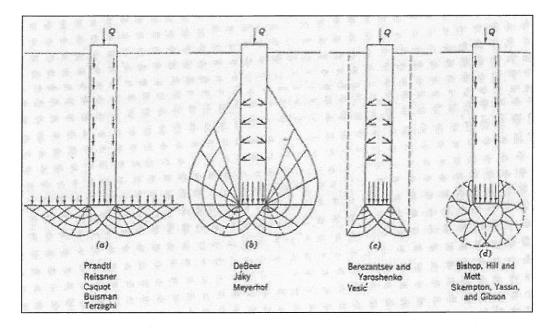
Typical failure patterns that might occur under deep foundations (ref. 23)
